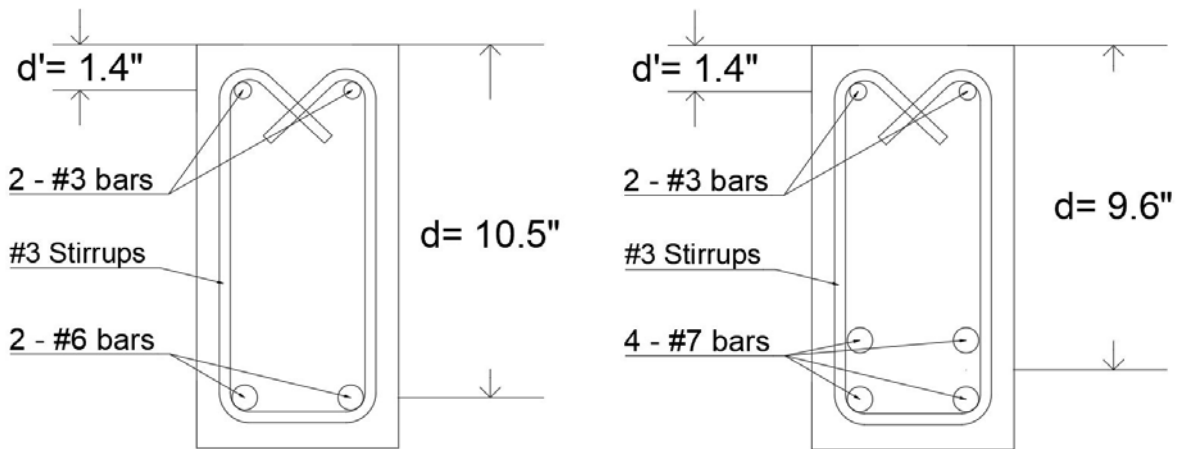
Beam cross section for the tension controlled beams (left) and the compression controlled beams (right)
